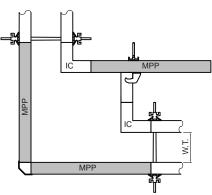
USING MPP TO FORM PILASTERS AT CORNERS
